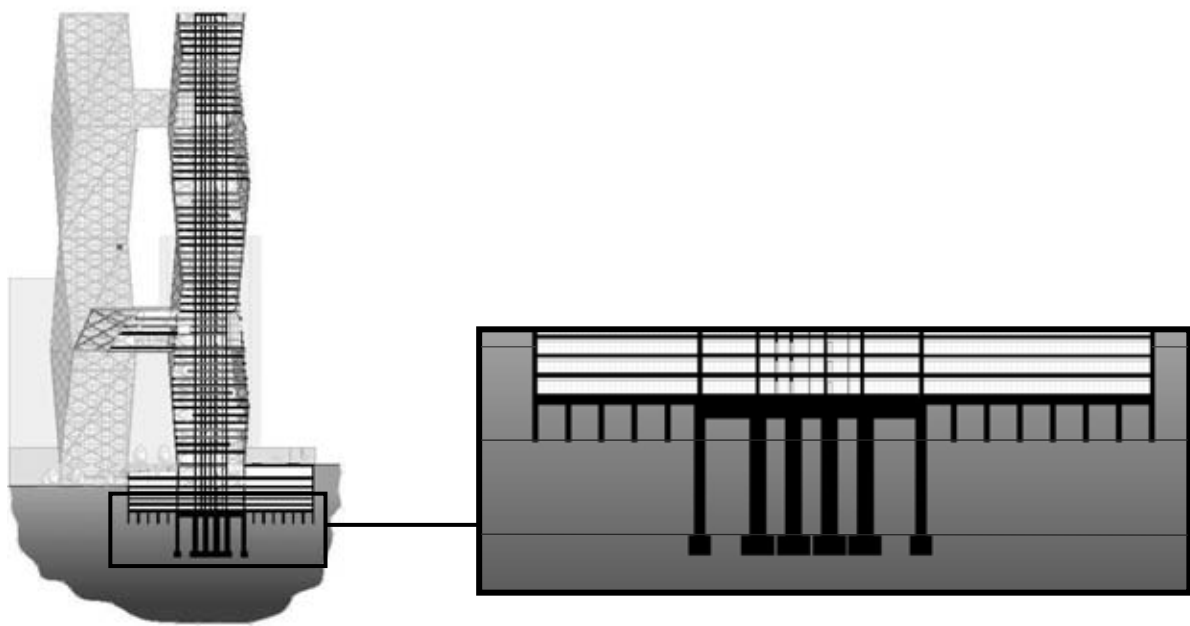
SECTION TWIN TOWERS WITH FOUNDATION DETAIL
